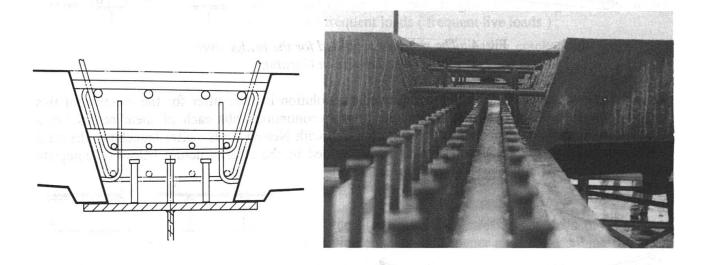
A precast concrete slab in independent elements, transversally connected by reinforcement bars.
